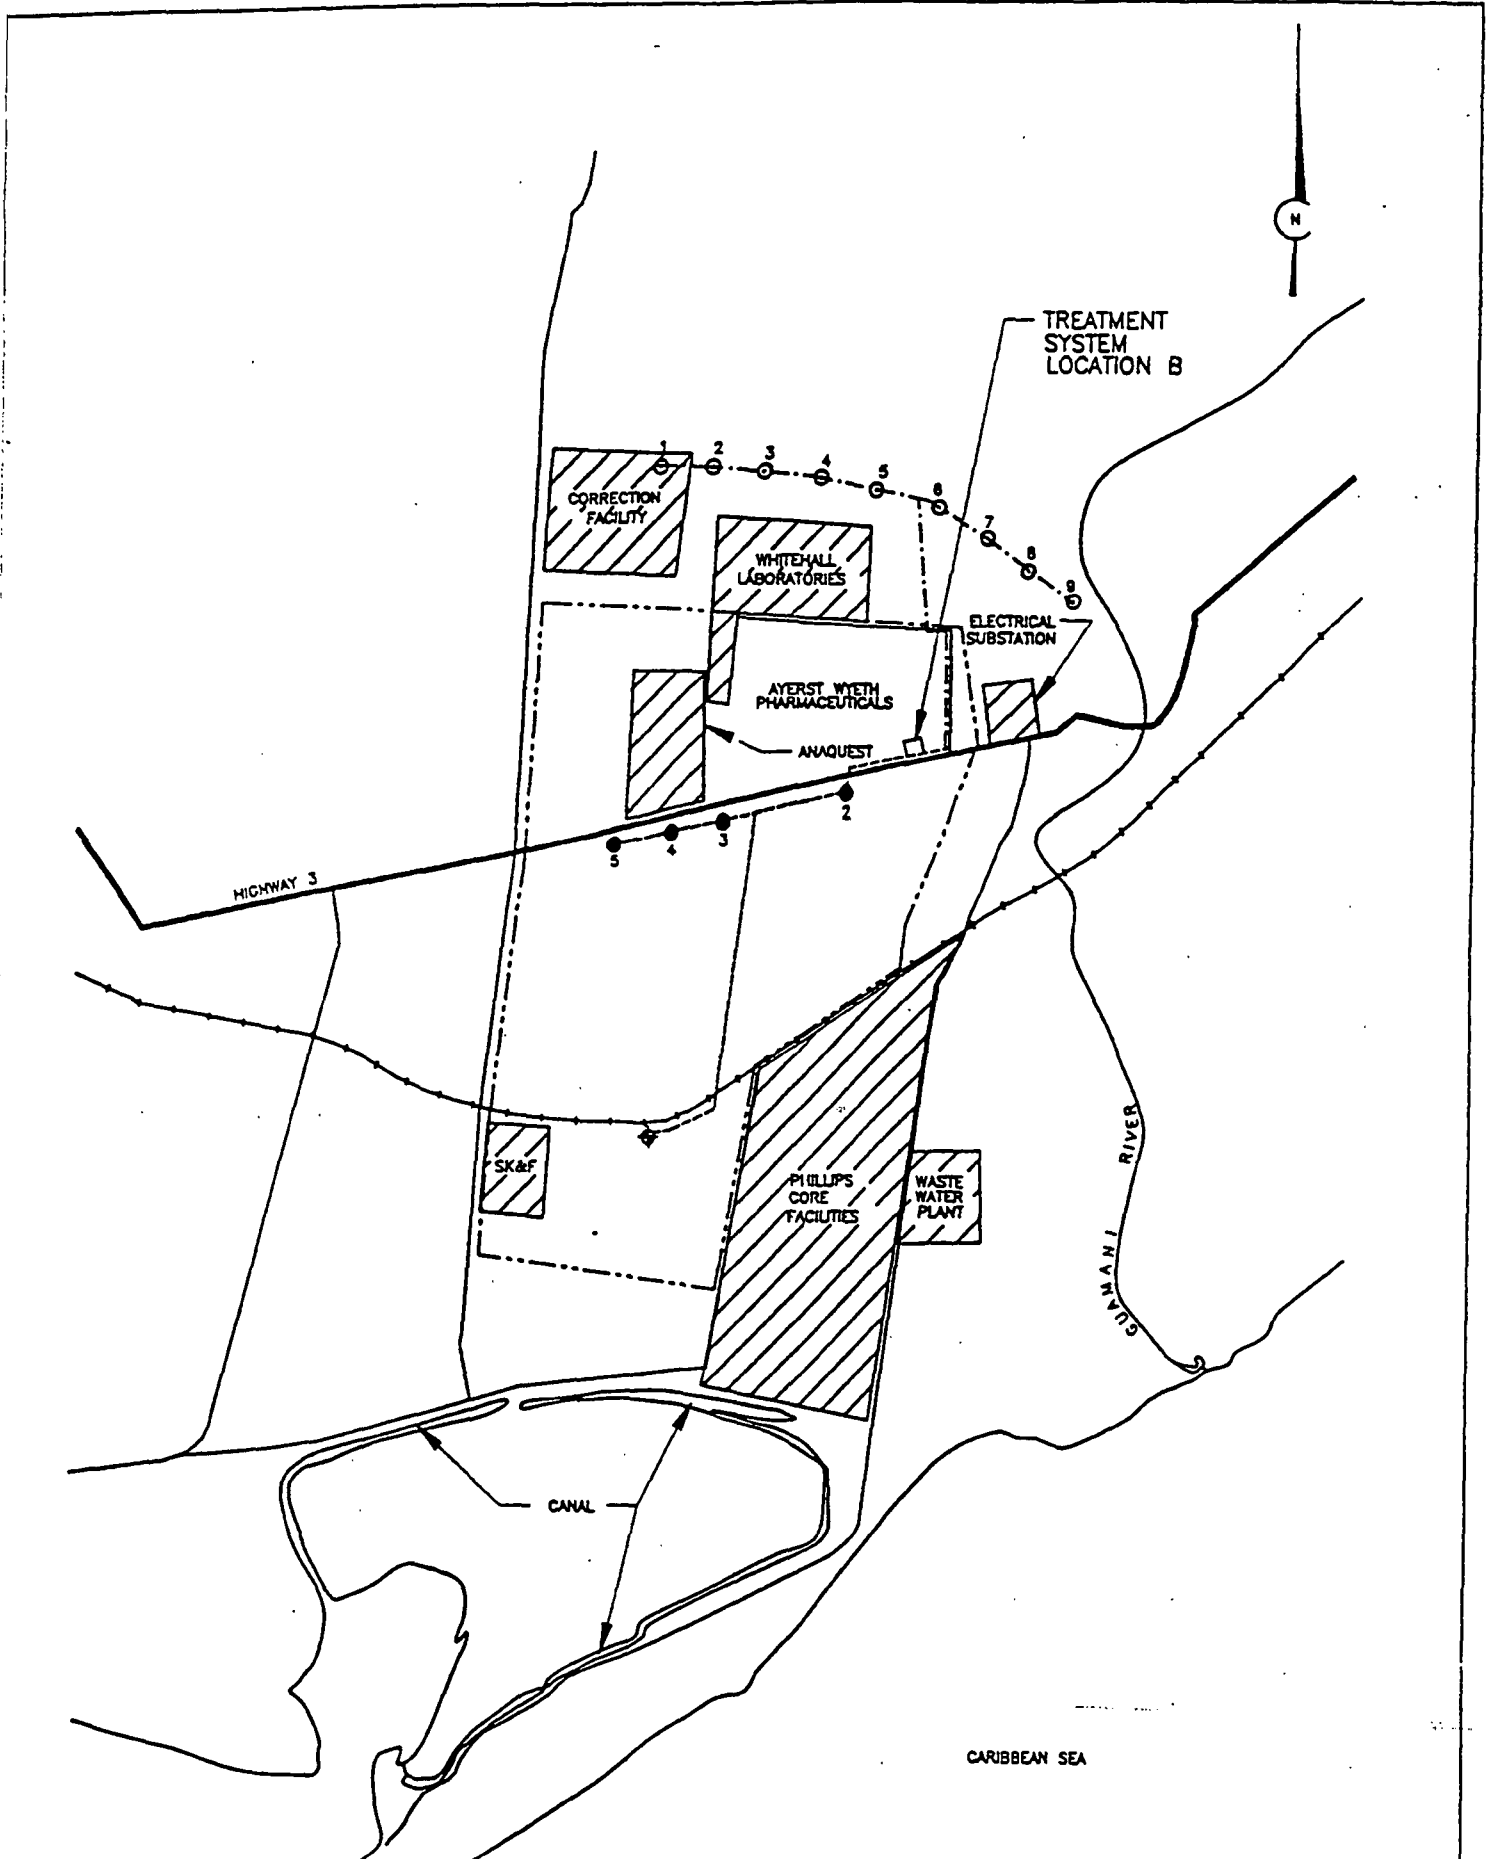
LAYOUT OF ALTERNATIVE J-2
